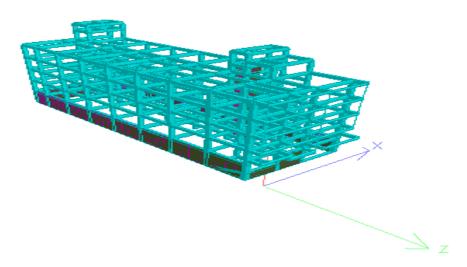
Isometric view of prototype model developed in STAAD.Pro CONNECT Edition
